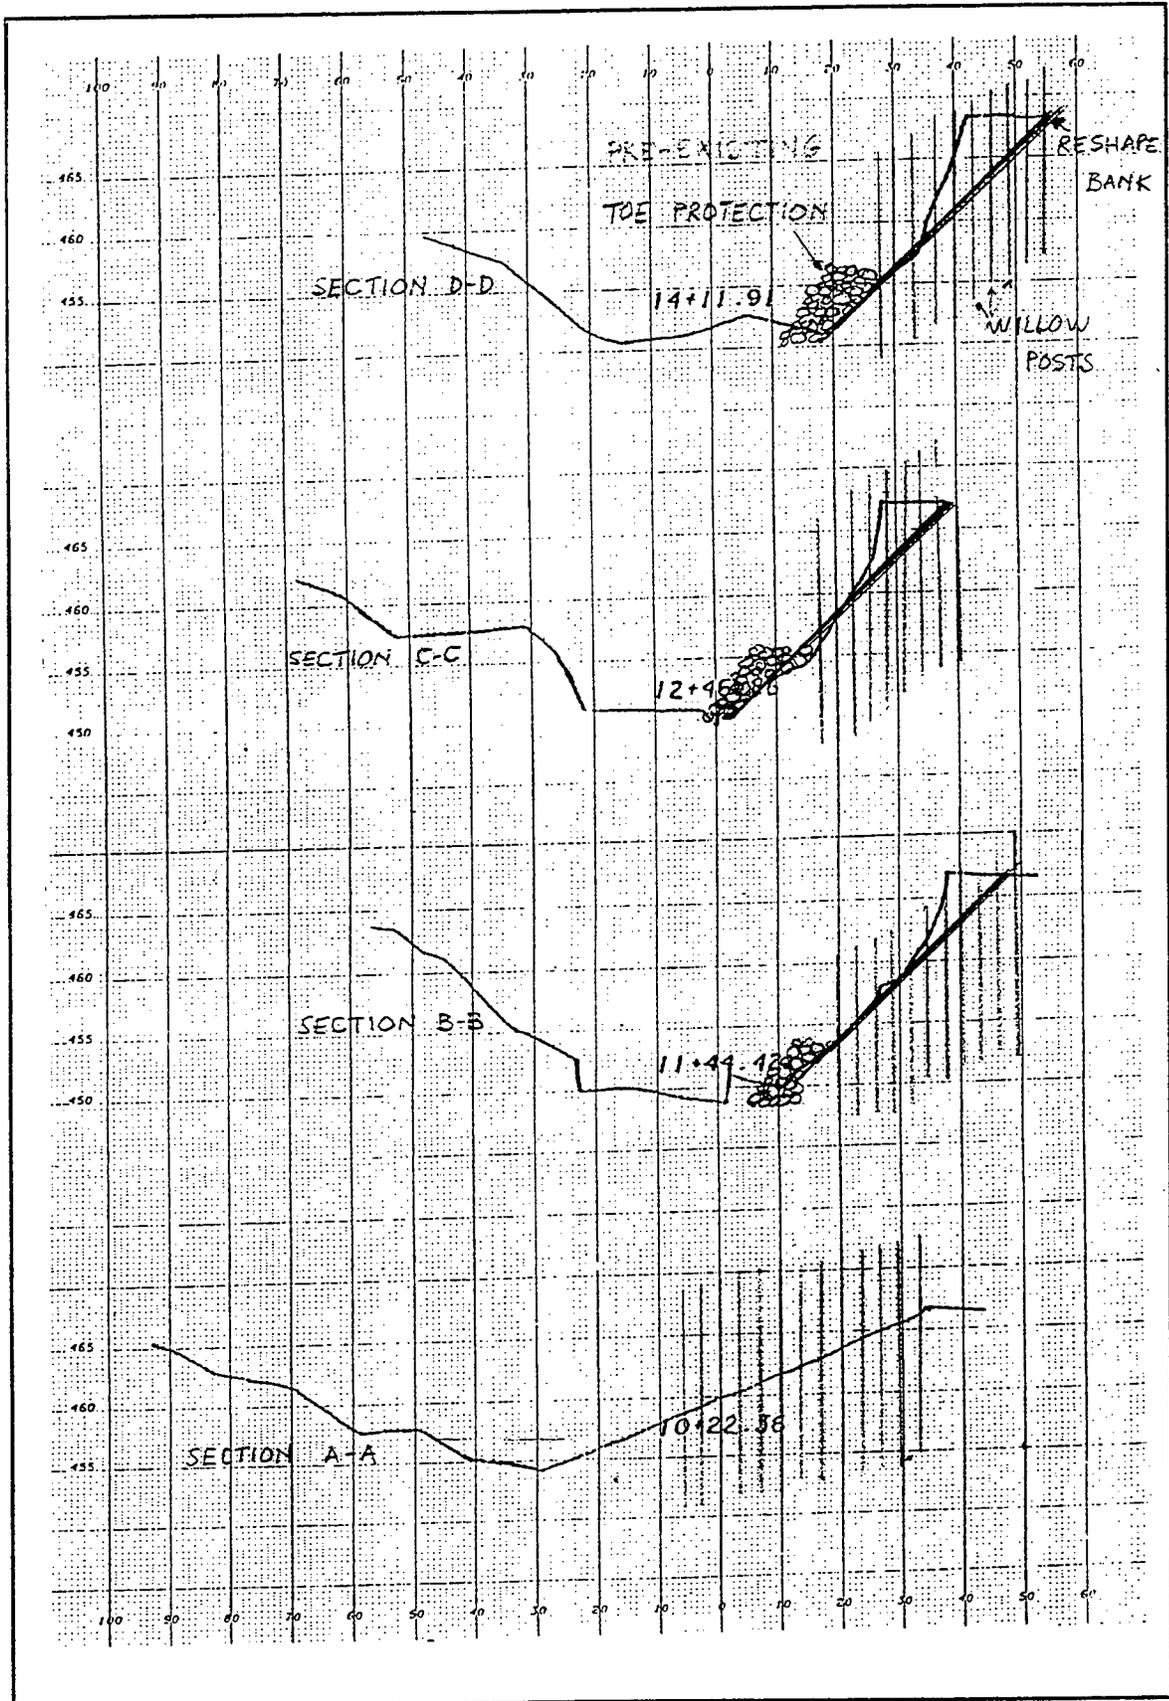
Cahokia Creek site alternative 1 design schematic (cross-section view).
